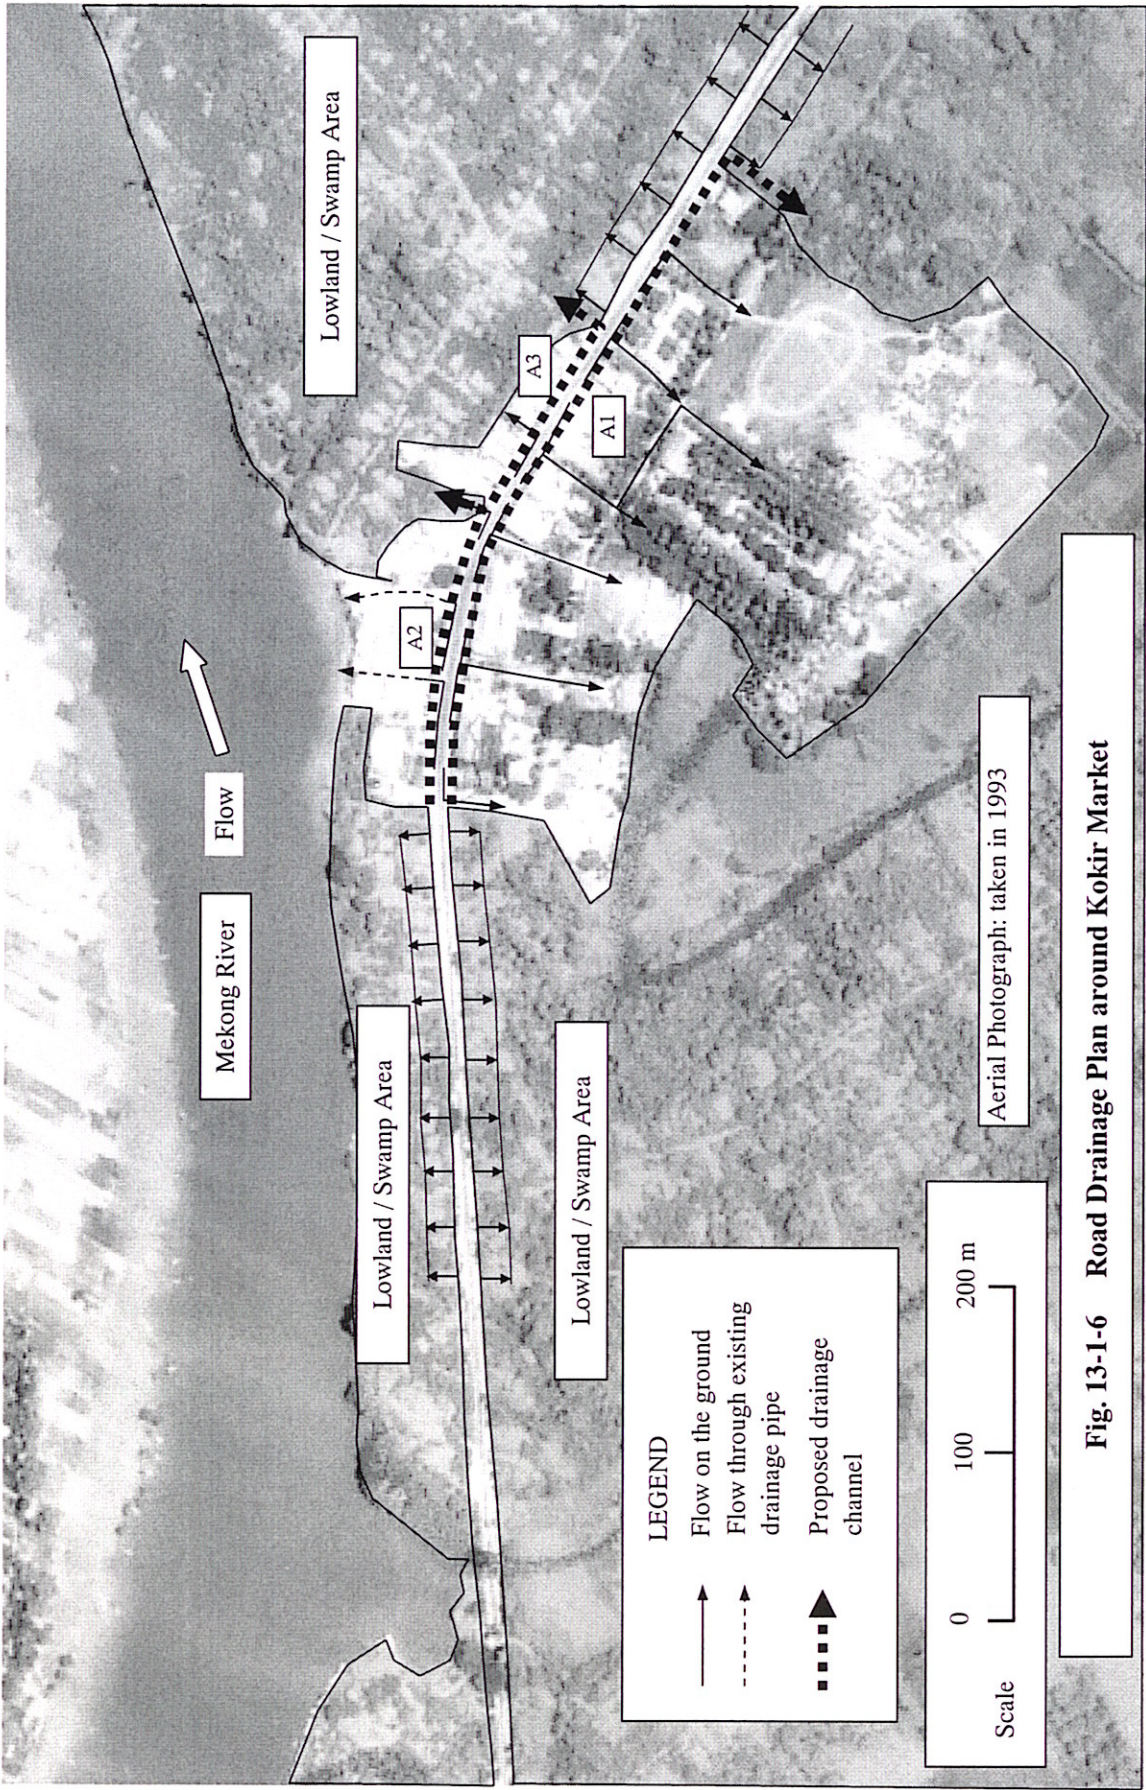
Road Drainage Plan around Kokir Market
